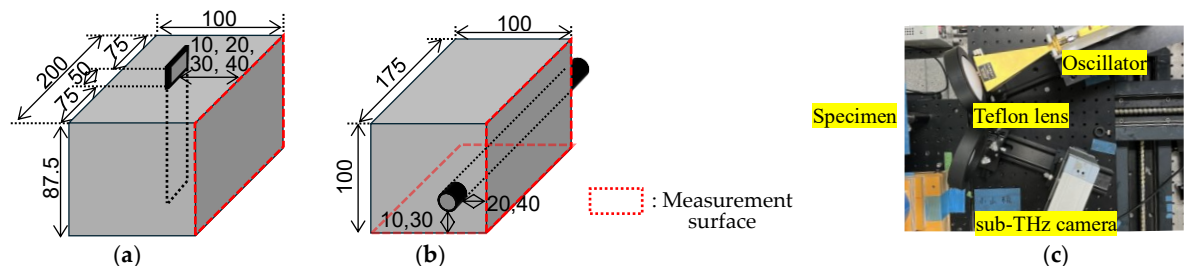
Specimen for measurement and measurement system. (a) Steel plate specimen (unit: mm). (b) Rebar specimen (unit: mm). (c) Measurement system with sub-THz camera.
